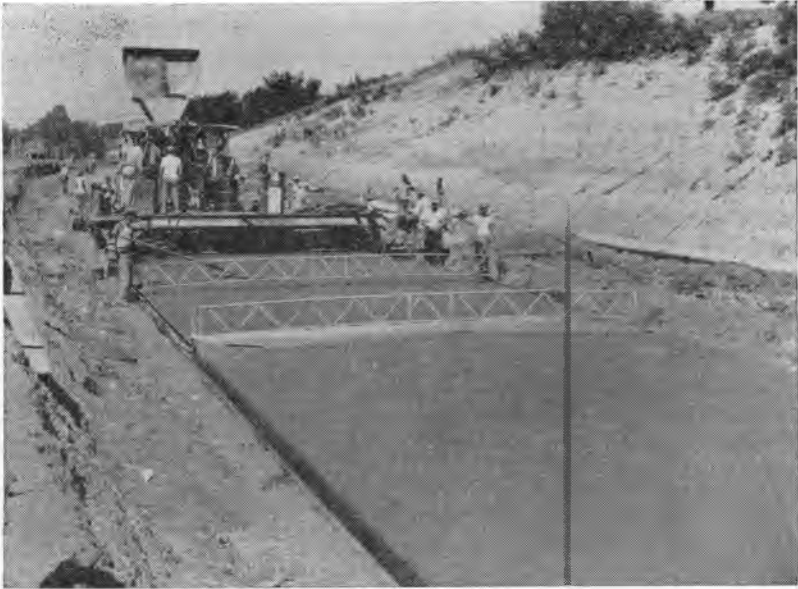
Rear view of machine shown in Fig. 9. Here the finished base course is shown.
